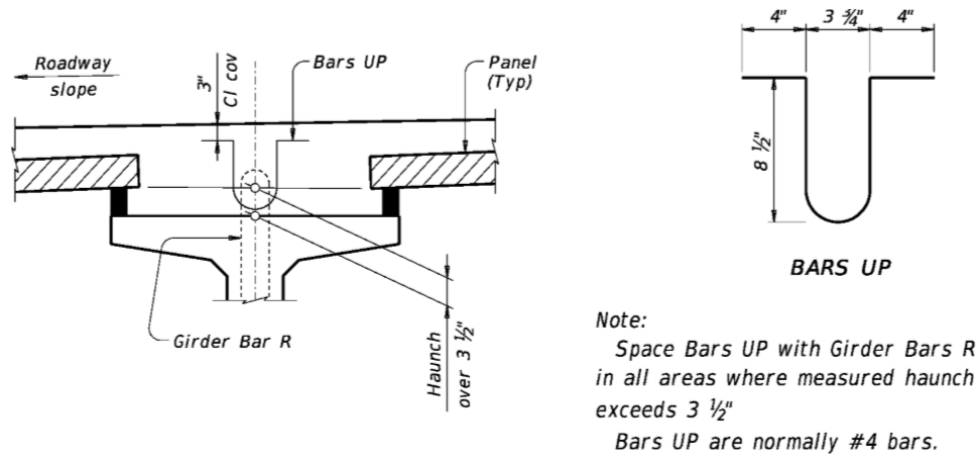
Detailing Practices for PSC Girders with PCPs (TxDOT 2022)
